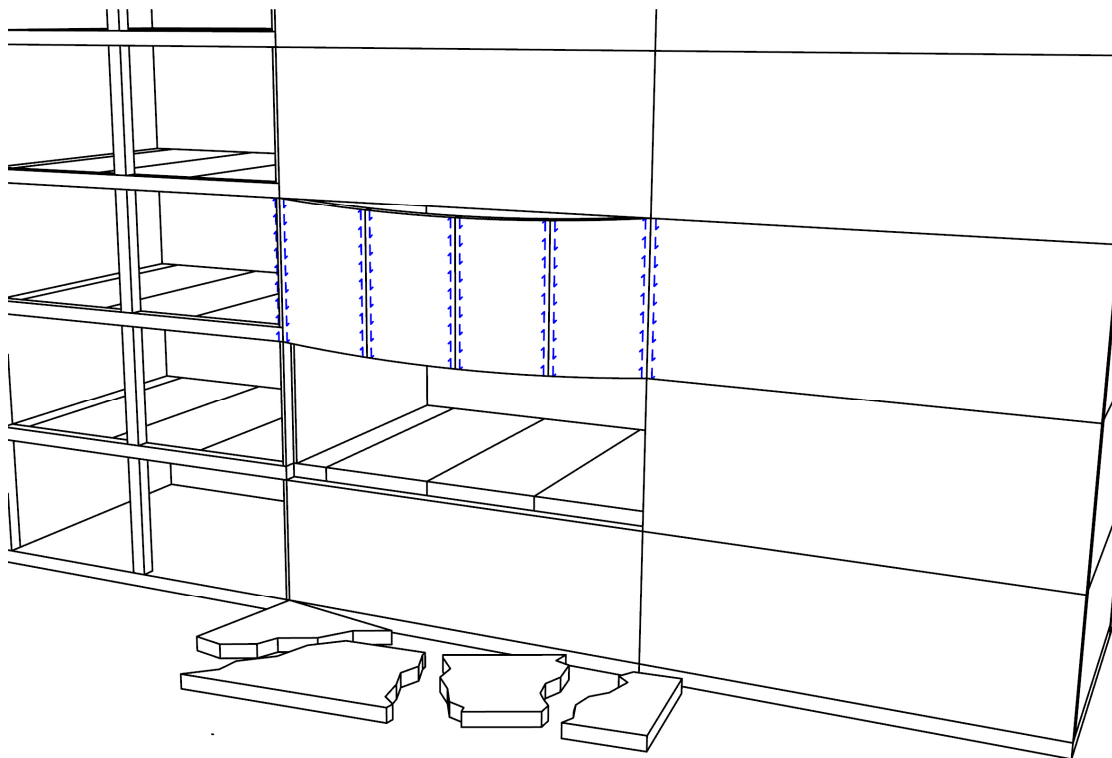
Wall structure acting as a high beam after losing support from the wall beneath.
